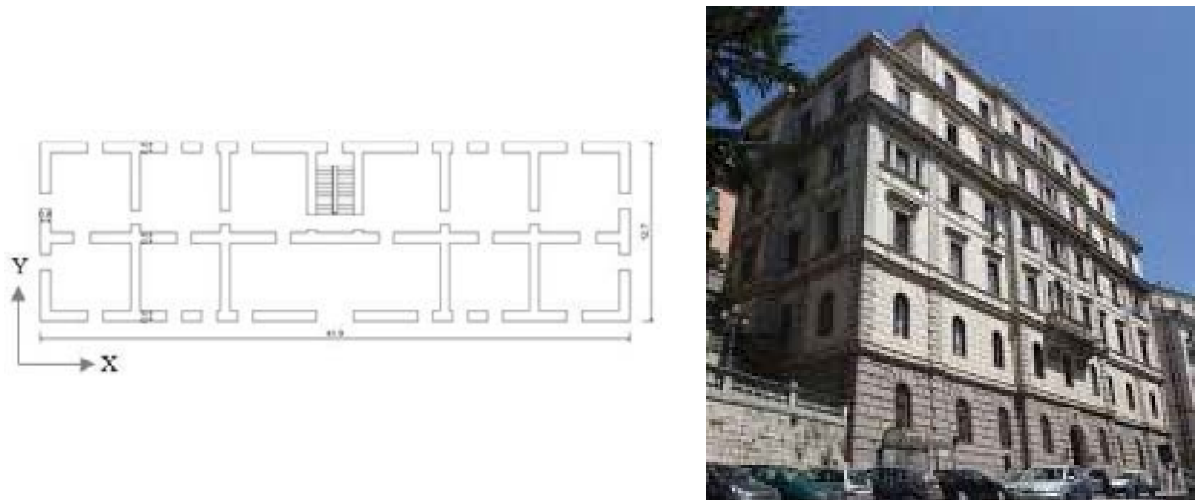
MUR6,Hr,Reg,C building typology: plan geometry of the first story (left) and a picture (right).
